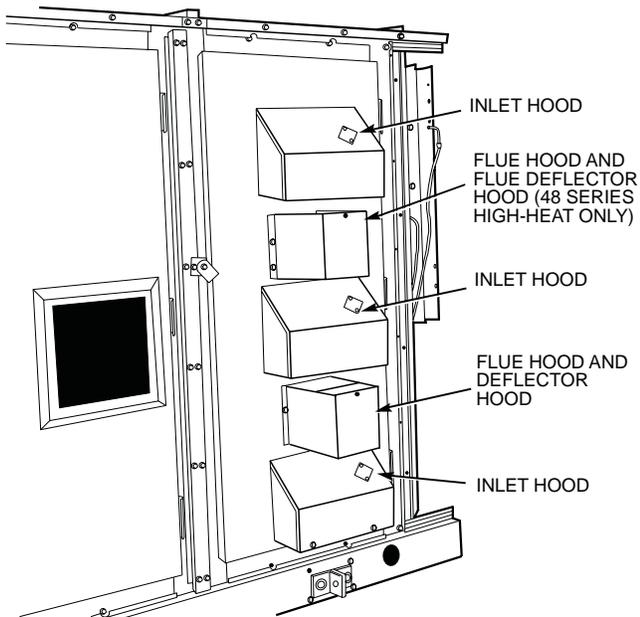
Flue/Inlet Hood Locations, 030-060 Units
